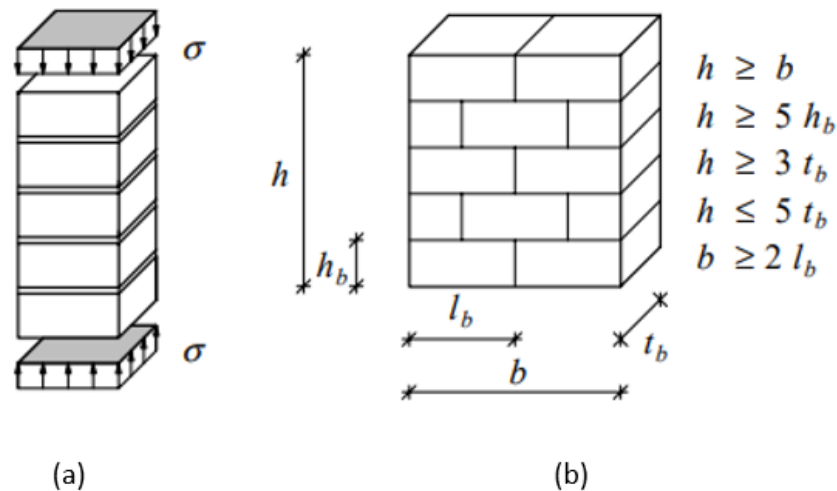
Uniaxial compression test (a) stack-bond prism; (b) RILEM test specimen (Lourenco, 1996)
